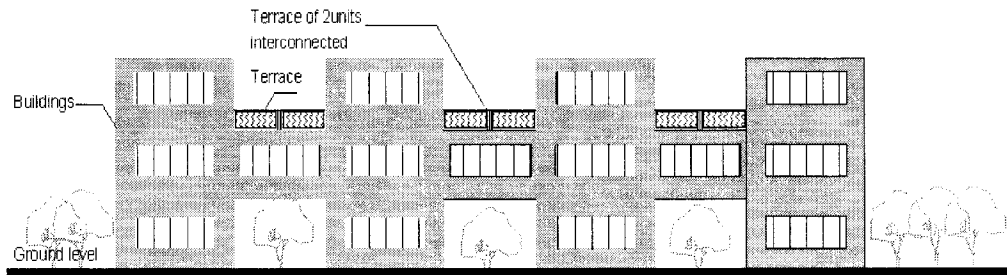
shows elevation of buildings that are linked by terraces in a large scale complex.
